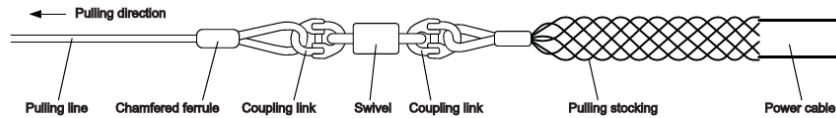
Cable End Connection to Pull-in Rigging (typical from [6])
